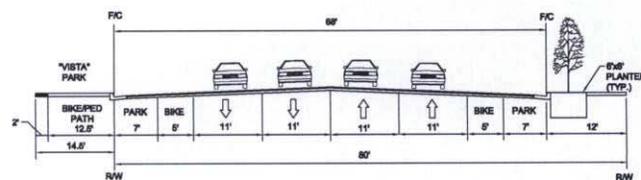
South Park Street Between Stanford Street and 5th Street (looking east)
